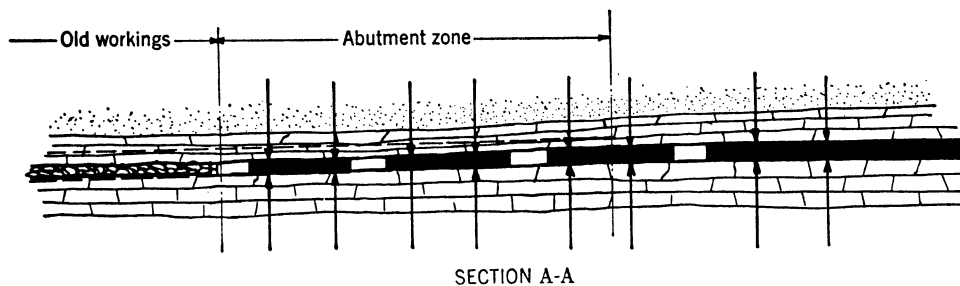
Load Transferred to Pillars in Abutment Zone. (Sec. A-A, fig. 2.)
